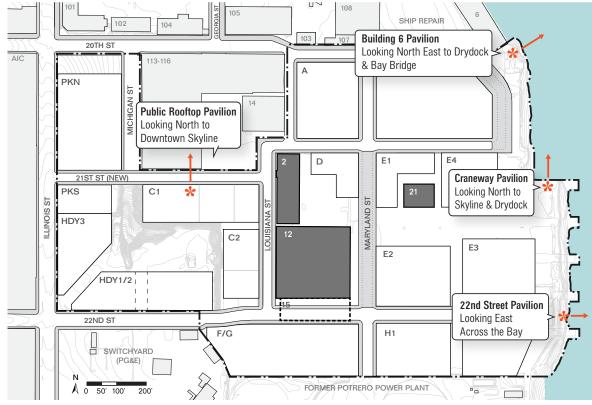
Illustrative Viewing Pavilions Locations Plan
